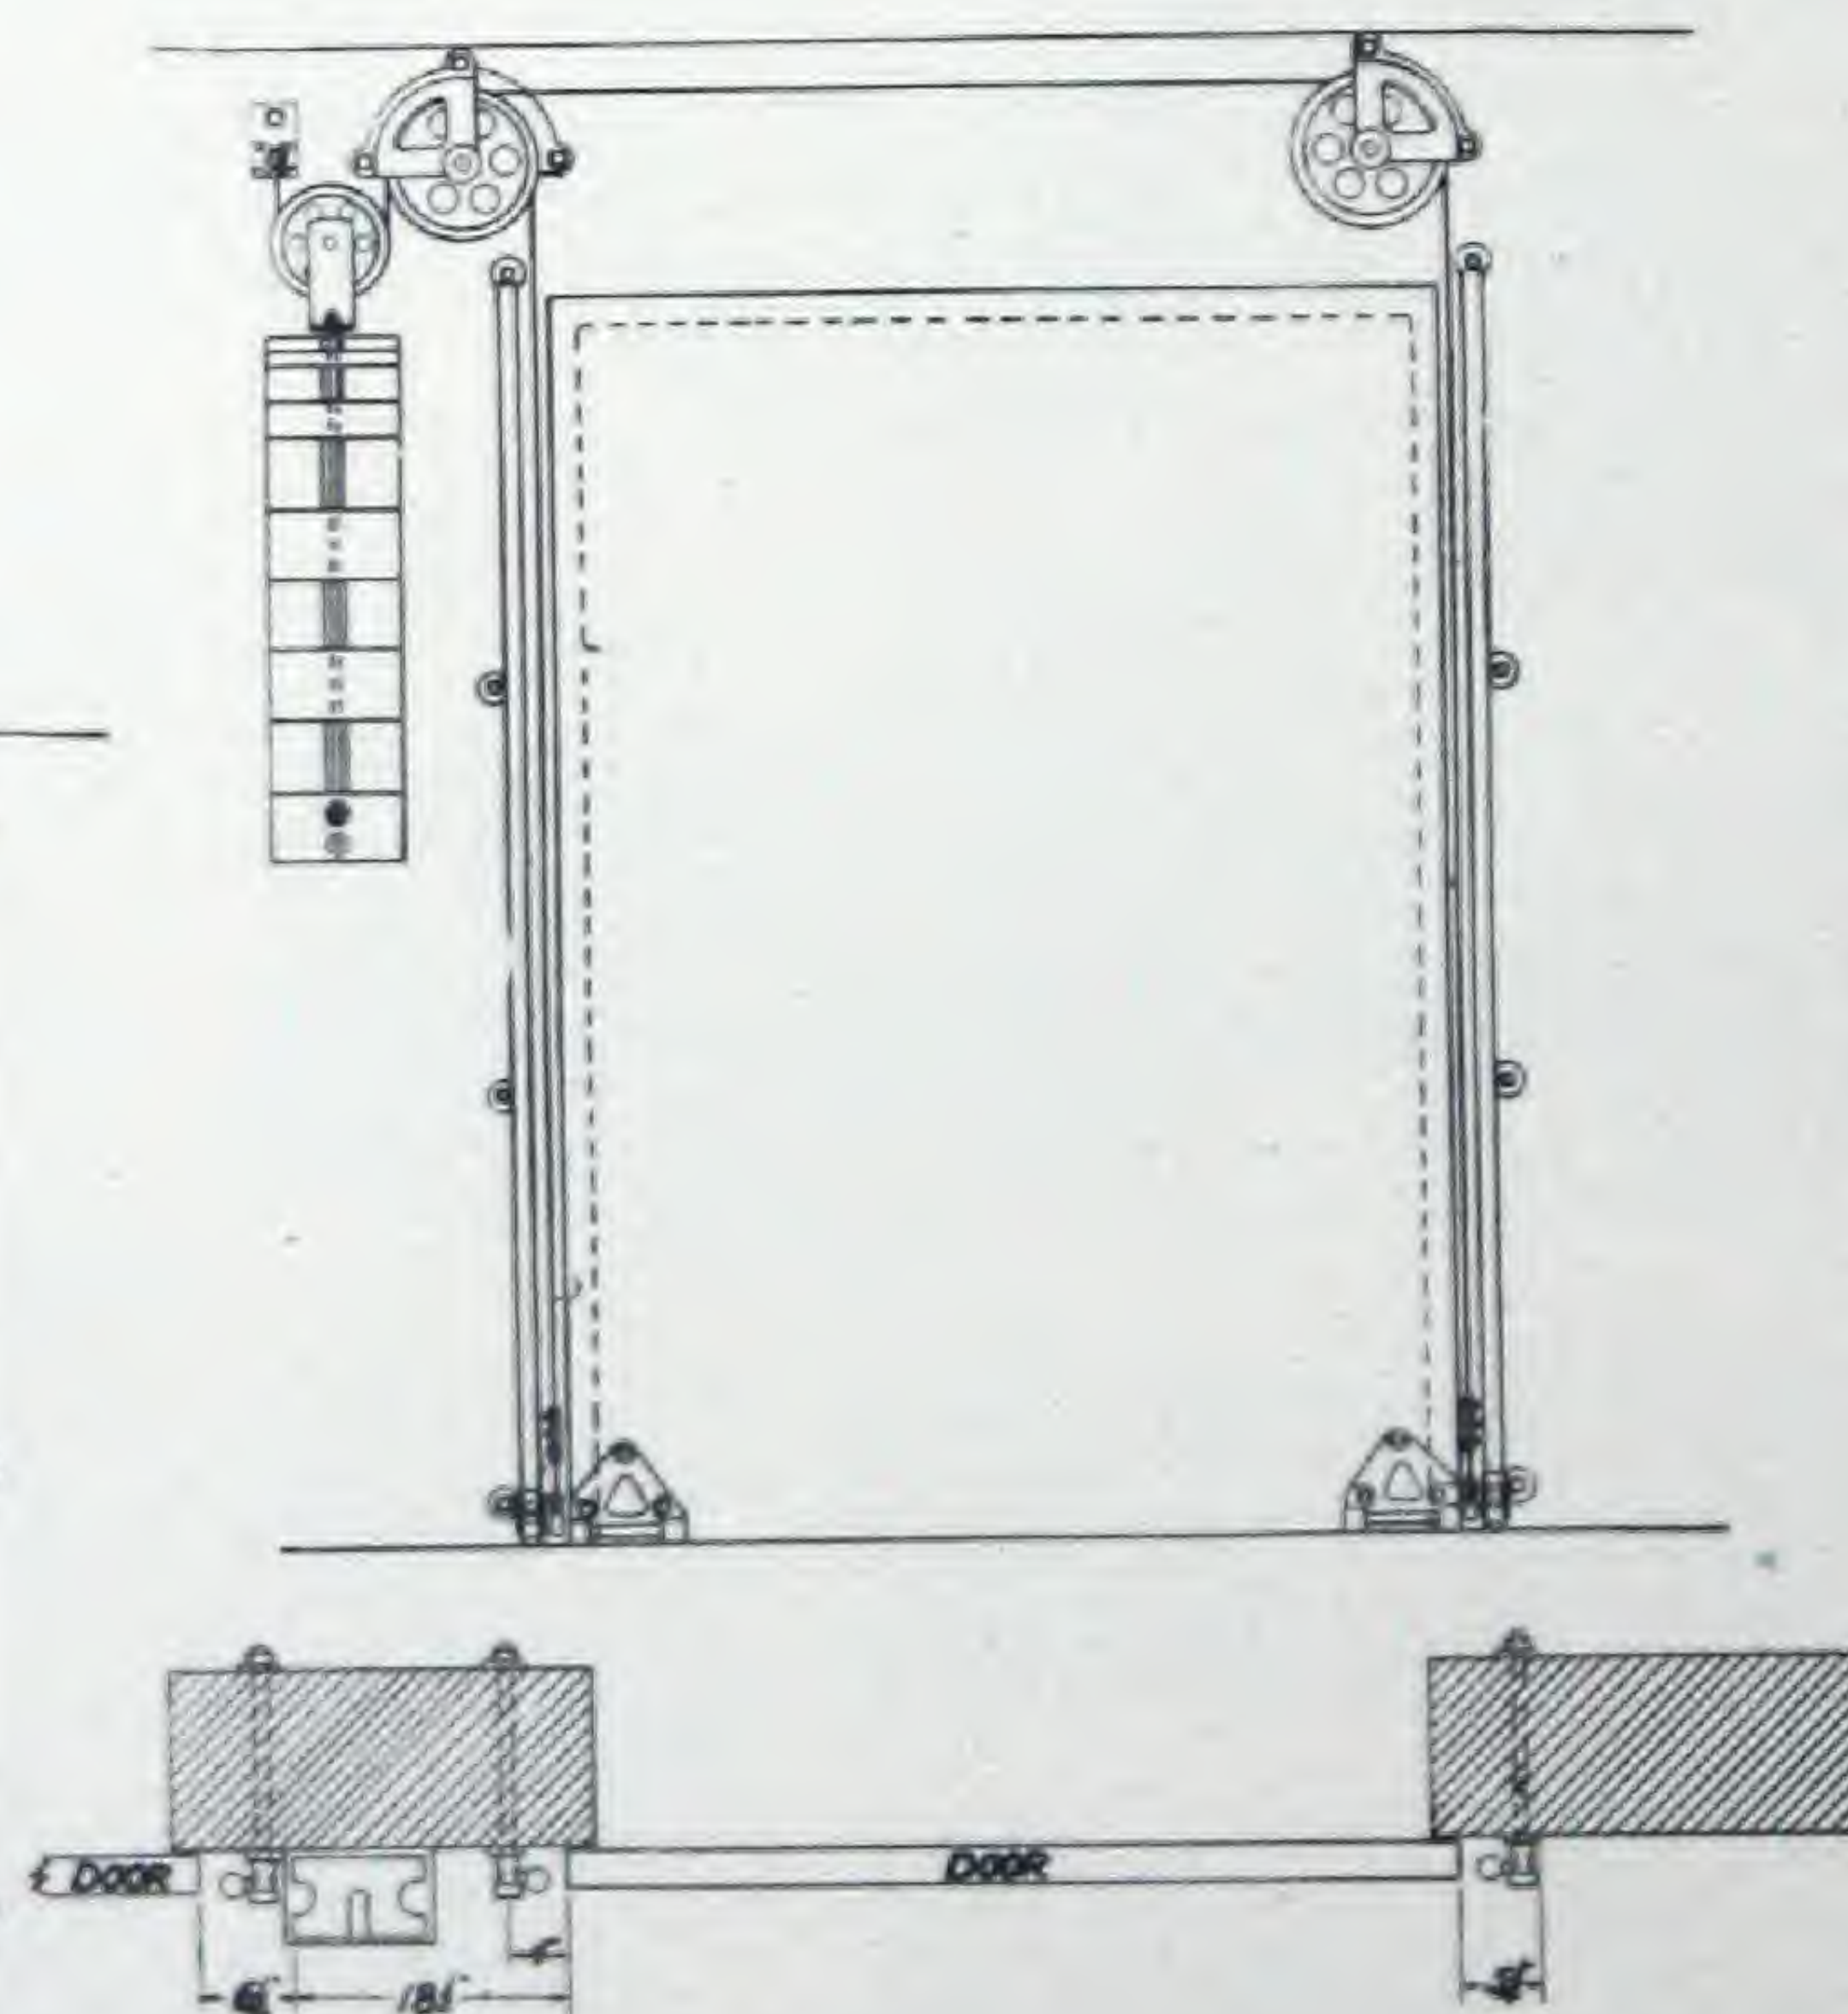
Detail B. Simple counterweight with opening cut through floor to permit full travel of counterweights.
